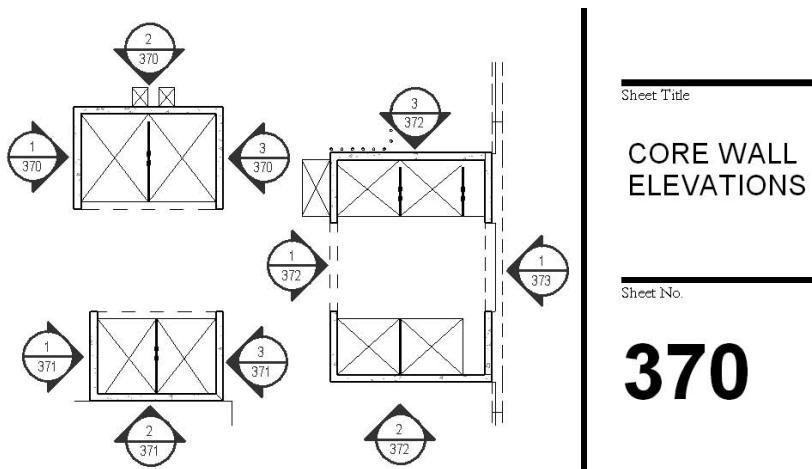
shows a similar example of a key plan displaying the parametric section cuts to reference the location of core wall elevations that were used to call off construction joint locations, wall reinforcing, and embed plate locations. Everything automatically updates as the model changes or sections change locations.
